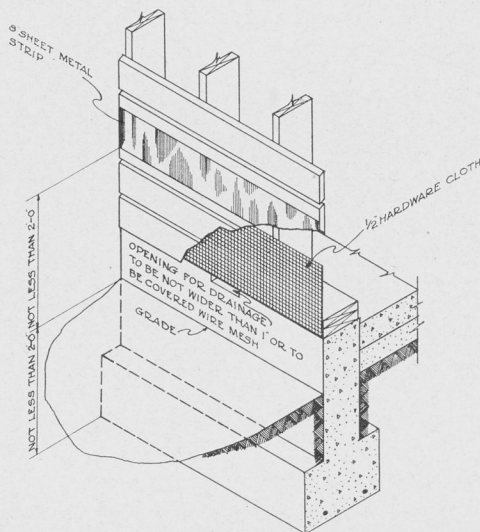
Where the top of foundation is less than a foot above ground level, adequate protection can be obtained by the use of hardware cloth and a strip of sheet metal 8 inches wide placed about 2 feet above ground level.
